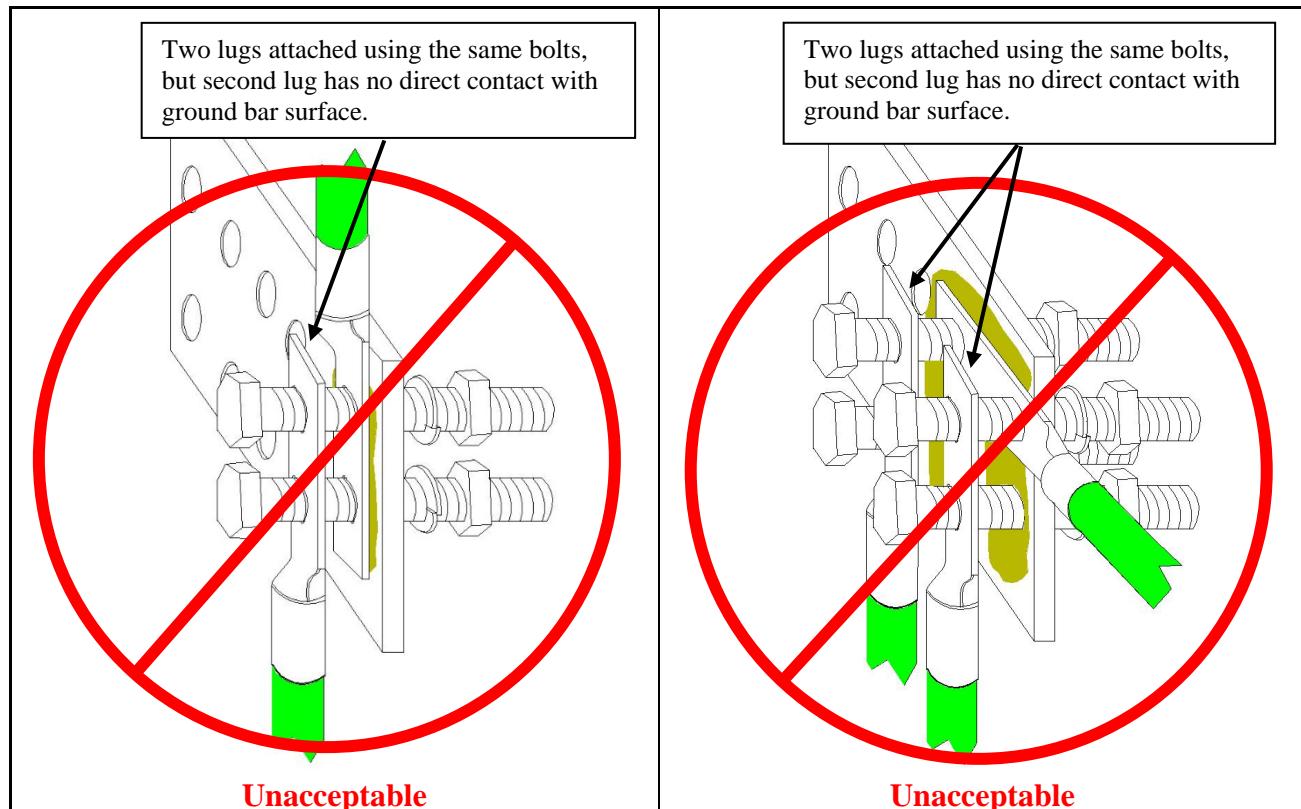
Unacceptable Two-Hole Lug Connection Examples
